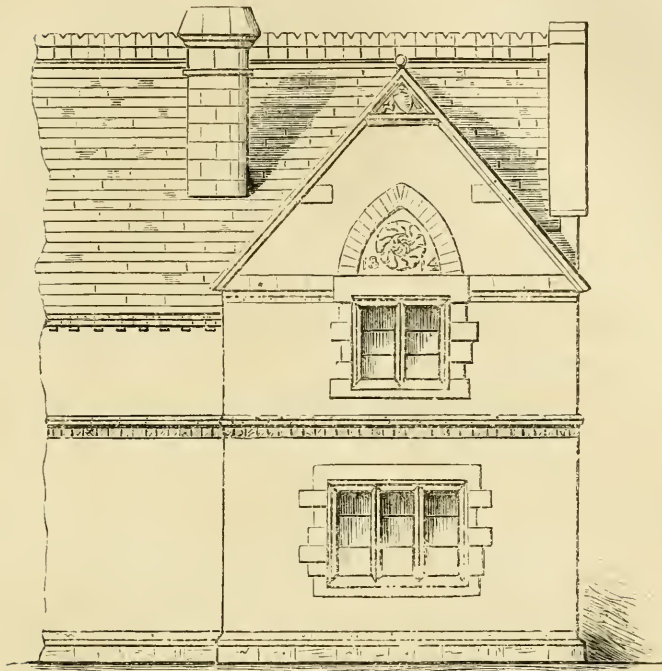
Plate III.—*Concrete Cottage, with Stone Ornamentation.
